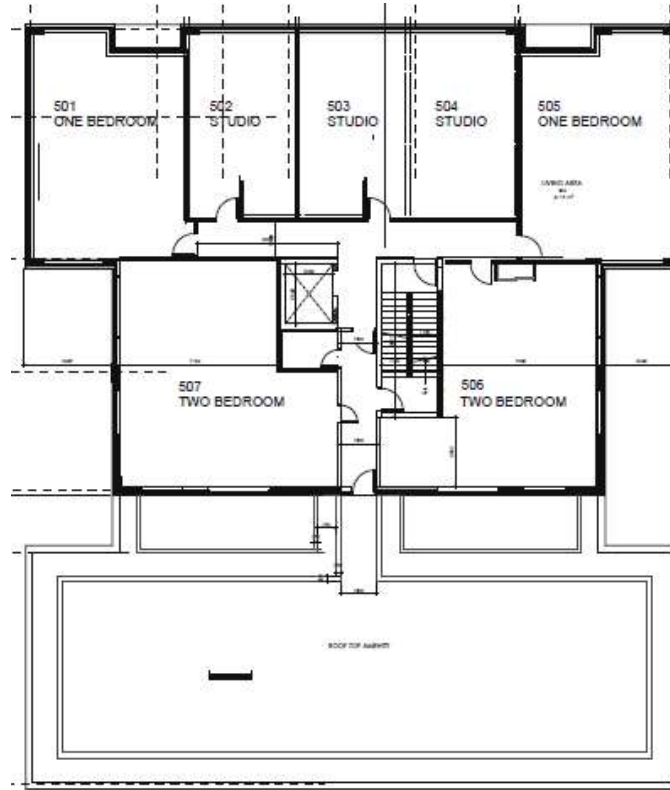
Exhibit U: Proposed fifth floor plan with three (3) studio, two (2) 1-bedroom units and two (2) 2-bedroom units and common access to rooftop terrace
